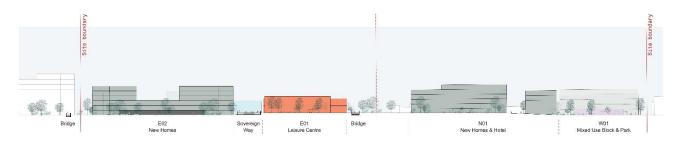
Masterplan illustrative elevation from the river north bank looking south
